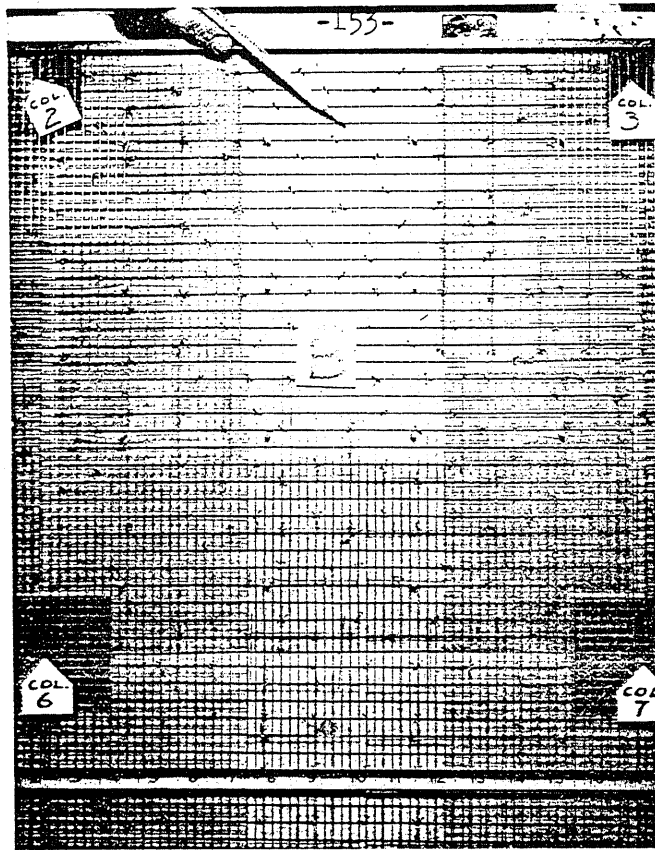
DETAIL OF REINFORCEMENT IN PLACE
